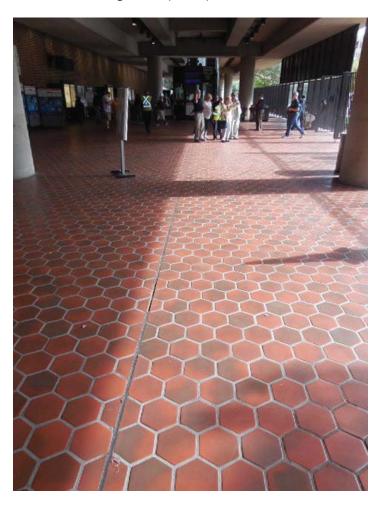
C13 King Street (South) – Handholes in mezzanine floor
